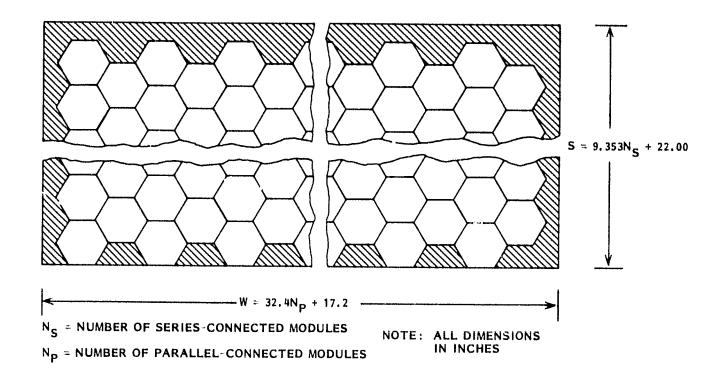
Shingle Module Arrangement on a Rectangular Roof Surface
